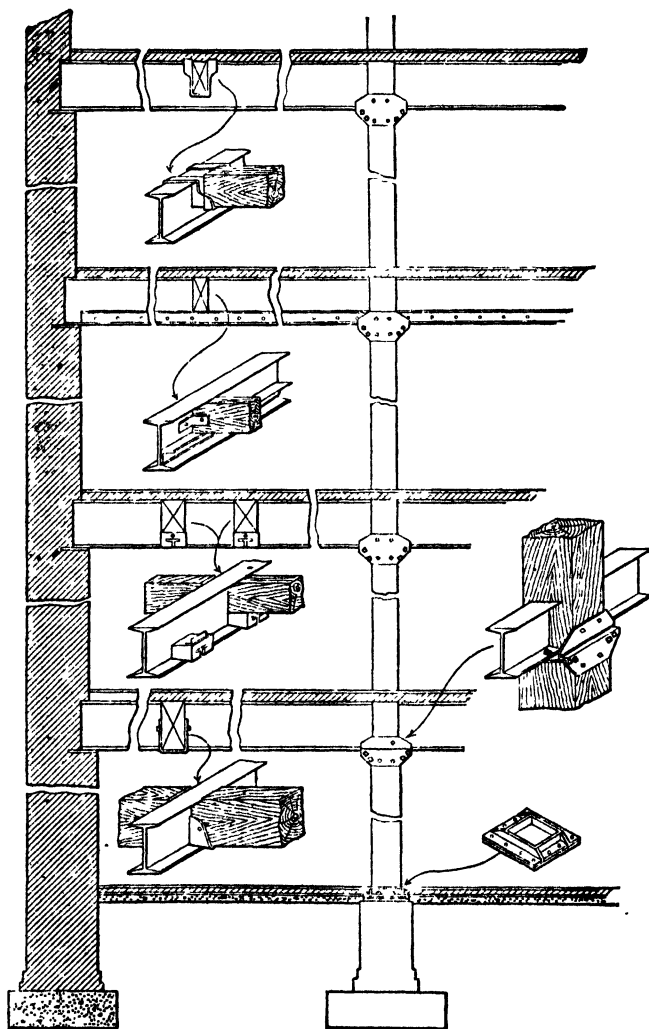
Mill-construction. Framing Steel Beams and Girders
